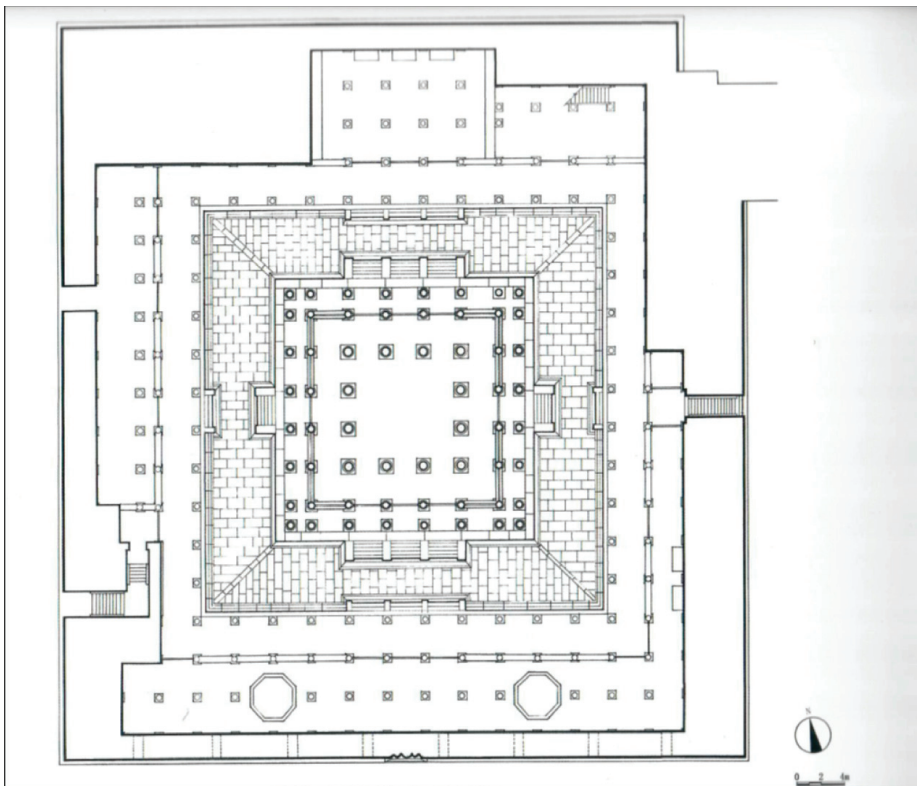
Plan of the first floor of buildings around the Dugang of Putuo Zongcheng Monastery (Yang and Zhu 2019, p. 196).
